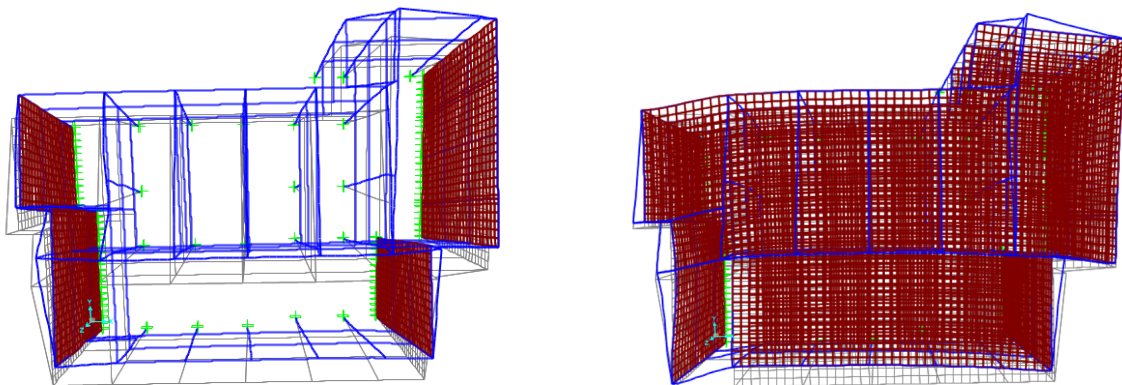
Comparison of in-plane deformed shape between models, with RC walls, with rigid floor assumption and not
